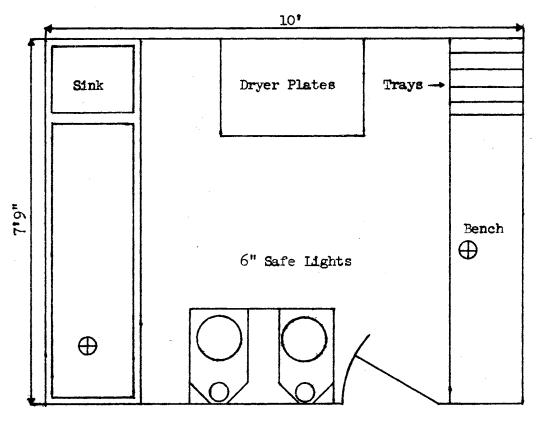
DARKROOM FLOOR PLAN - PONCA CITY DAILY NEWS. (SCALE 1/2" = 1")
